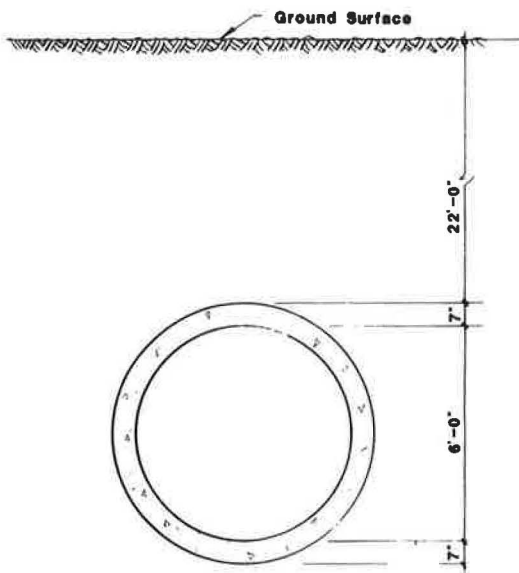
Pipe geometry for PIPECAR sample problem.
